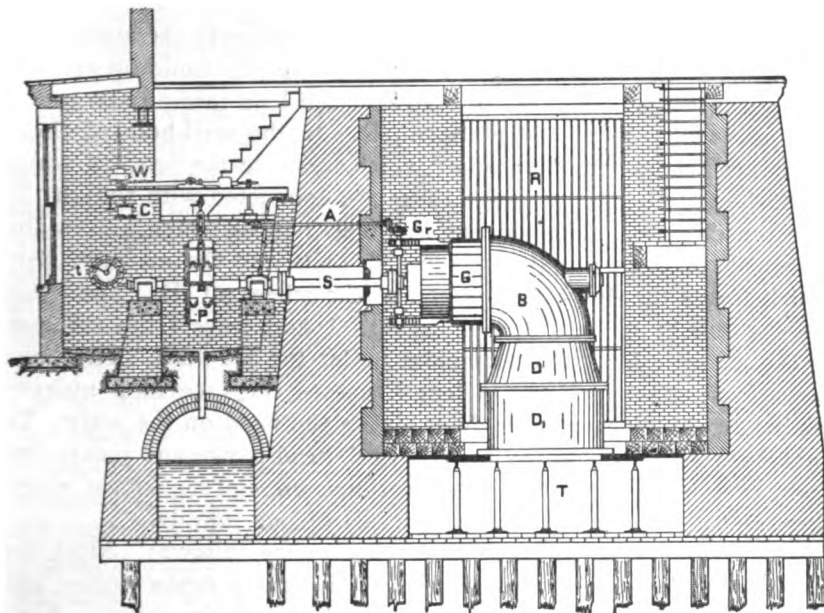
Testing Flume of Holyoke Water Power Co. Arranged for Testing Horizontal Turbines.
